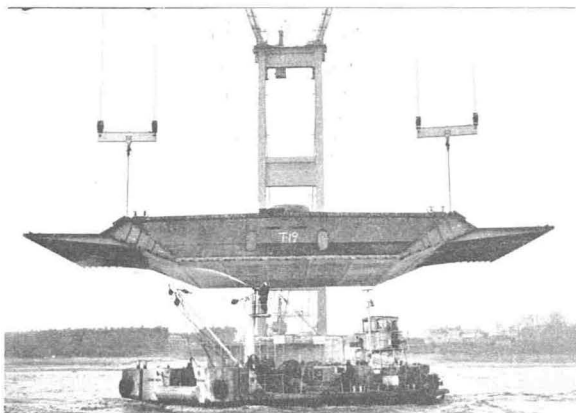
B. Severn Bridge employed new aerodynamic stability with shallow box configuration instead of stiffening truss.
